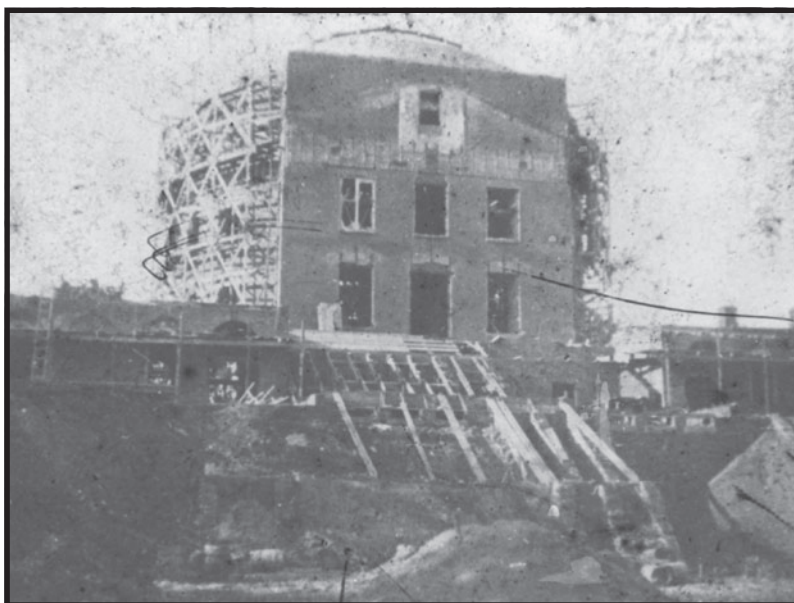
The Rotunda from the south during construction, 1896.
